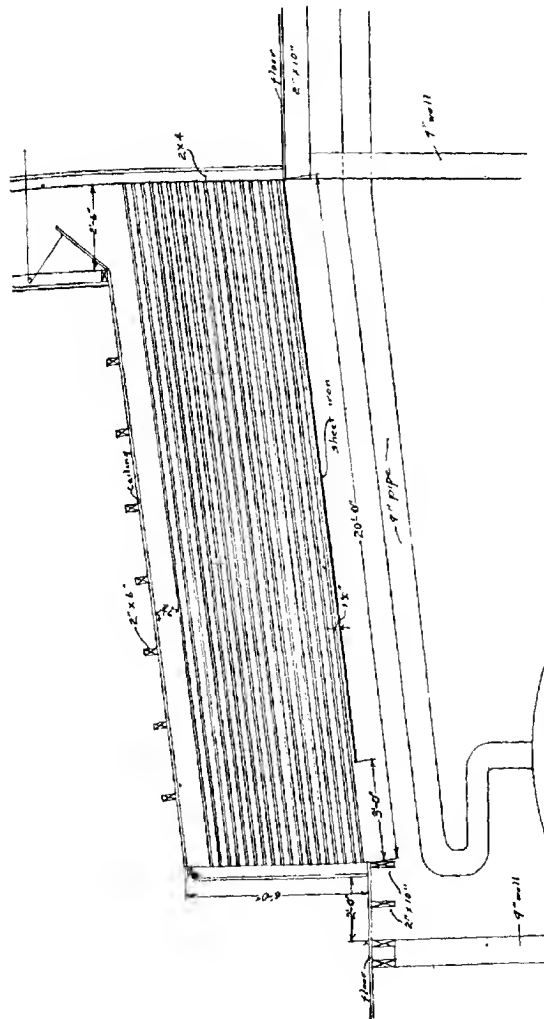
Fig. XIX.—Sectional Side View of Tunnel Evaporator.
